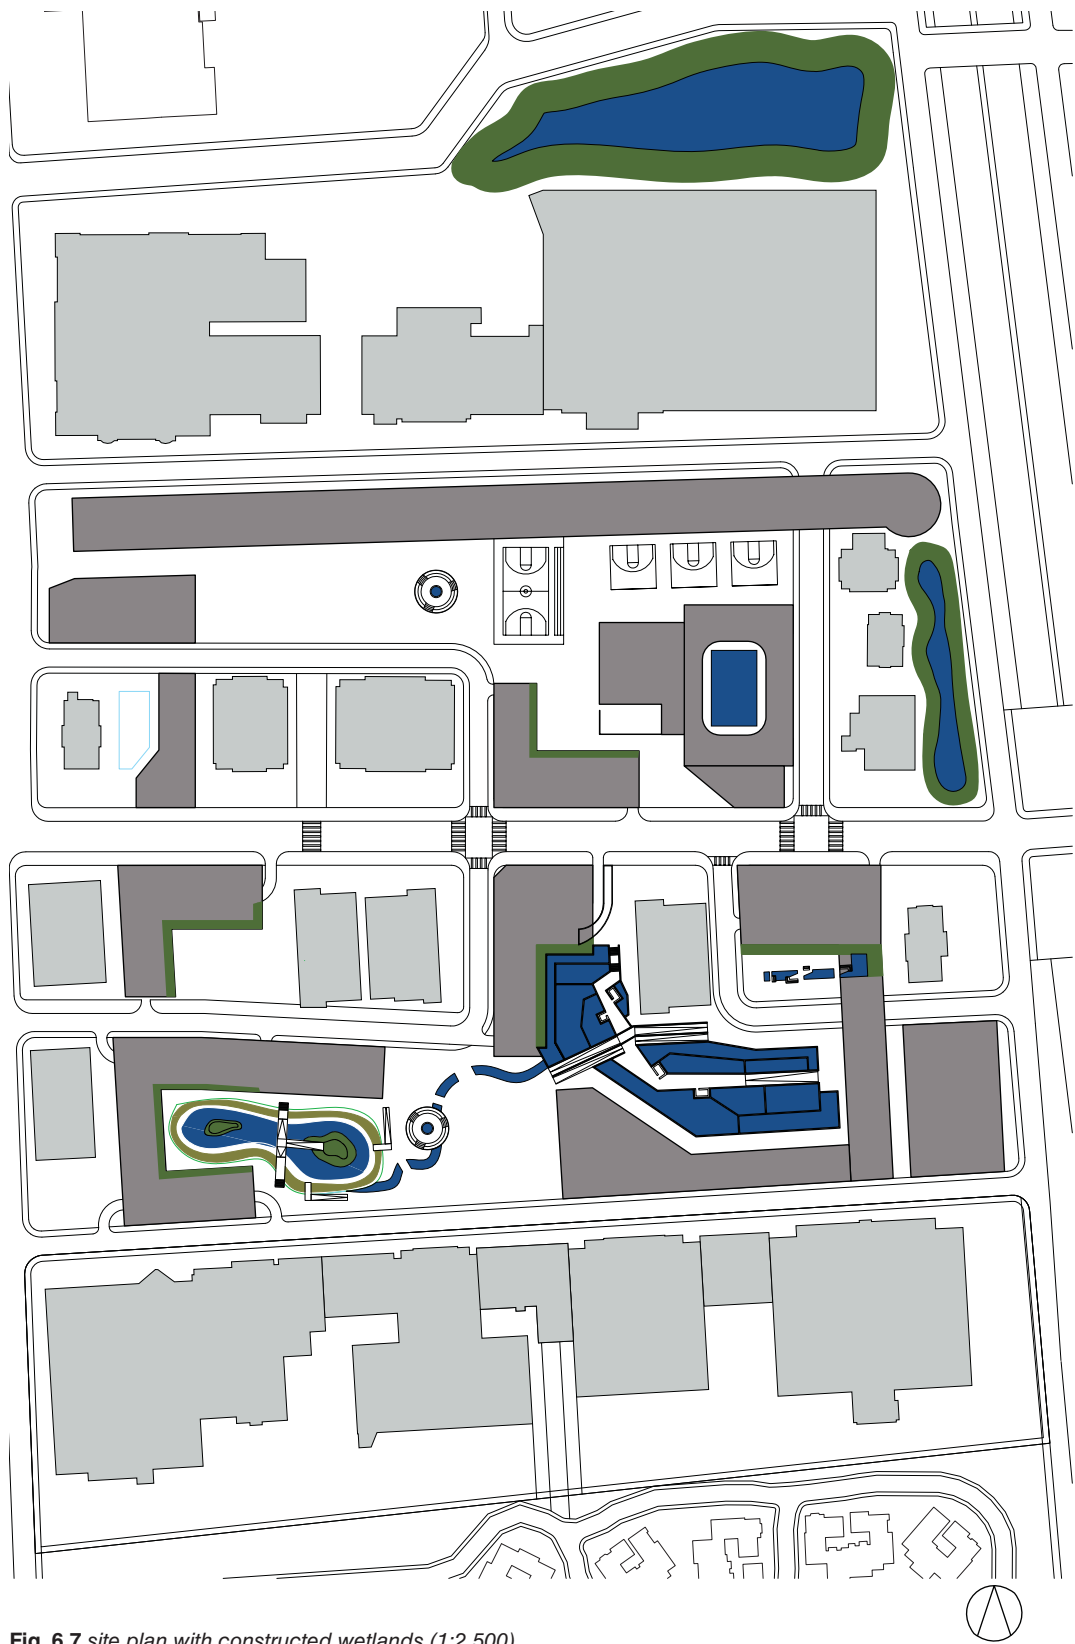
site plan with constructed wetlands (1:2,500)
